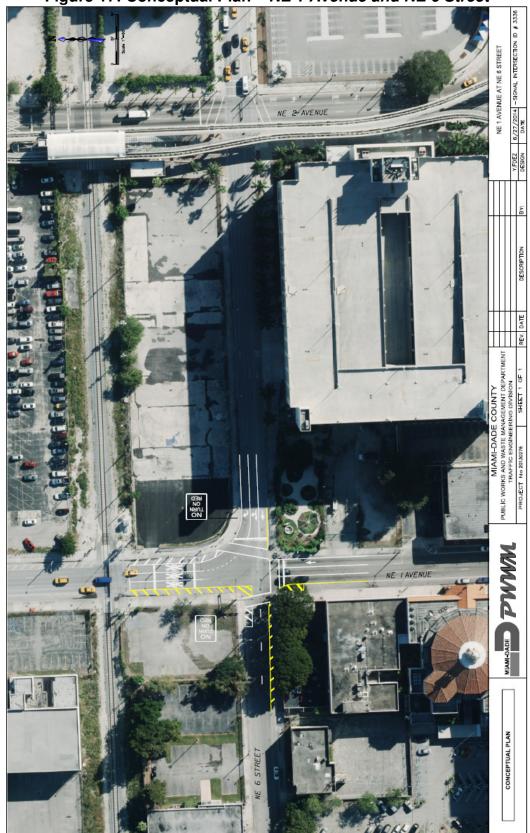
Conceptual Plan – NE 1 Avenue and NE 6 Street
